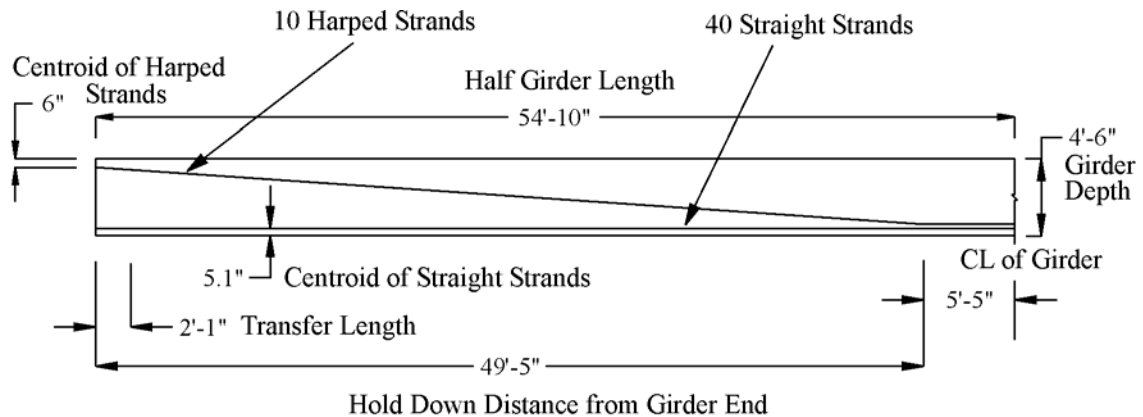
Longitudinal Strand Profile (half of the girder length is shown).
